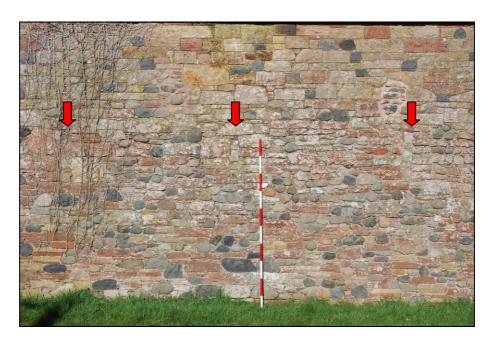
ventilation slits (arrowed); note rebuilt wall above ranging pole
